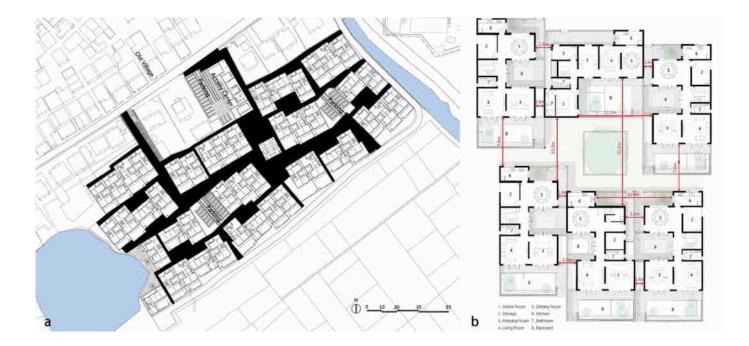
a. Site plan for Dongziguan Affordable Housing for Relocalized Farmers. b. Ground Floor Plan (part). Source: https://www.archdaily. com/802369/contemporary-rural-cluster-dongziguan-affordable-housing-for-relocalized-farmers-in-fuyang-hangzhou-gad.
